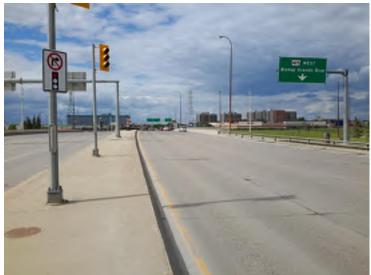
Looking south from median. Photo 08 Northbound looking north.
